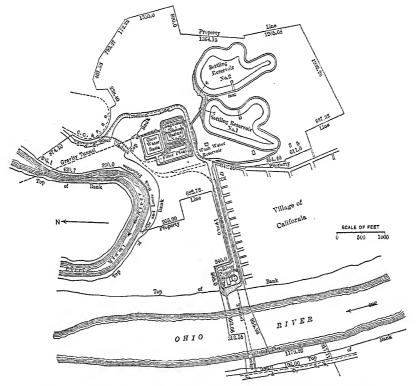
General plan of Cincinnati low-service pumping station, settling reservoirs and filter plant.
